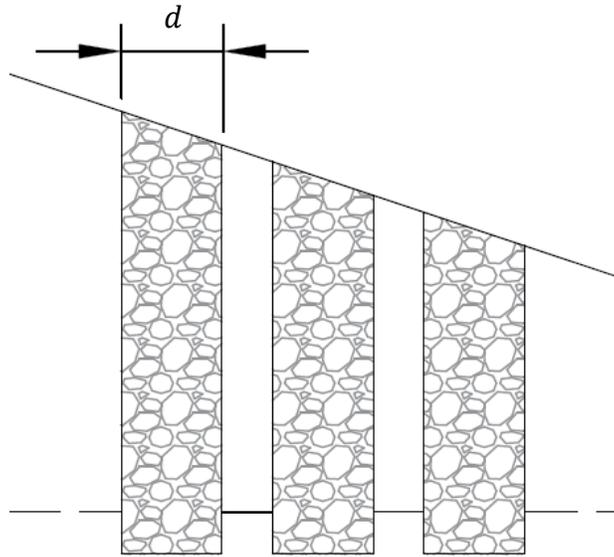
Schematic of three rows of rockfill columns in cross section, for modelling using the average shear strength method.
